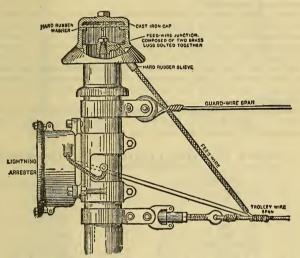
METHOD OF CONNECTING UNDERGROUND CABLE TO OVERHEAD LINE CONSTRUCTION.
